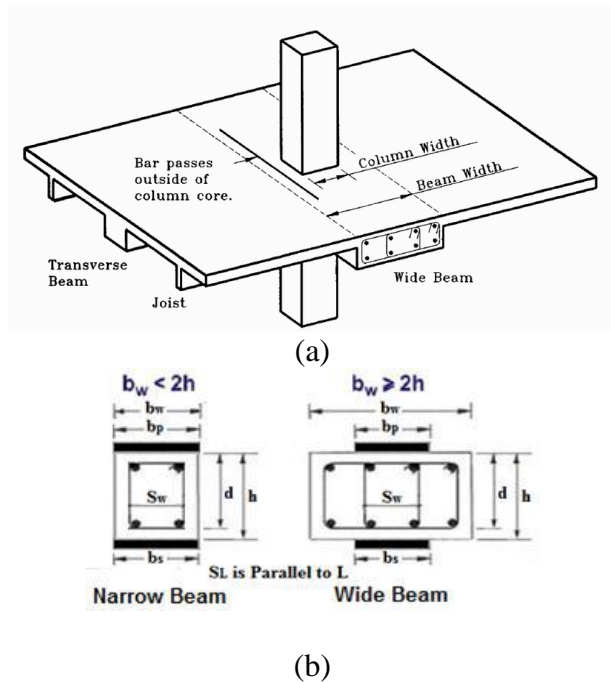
Concrete wide beam: a) Wide beam integrated in slab system; b) Wide and Narrow beam [20]
